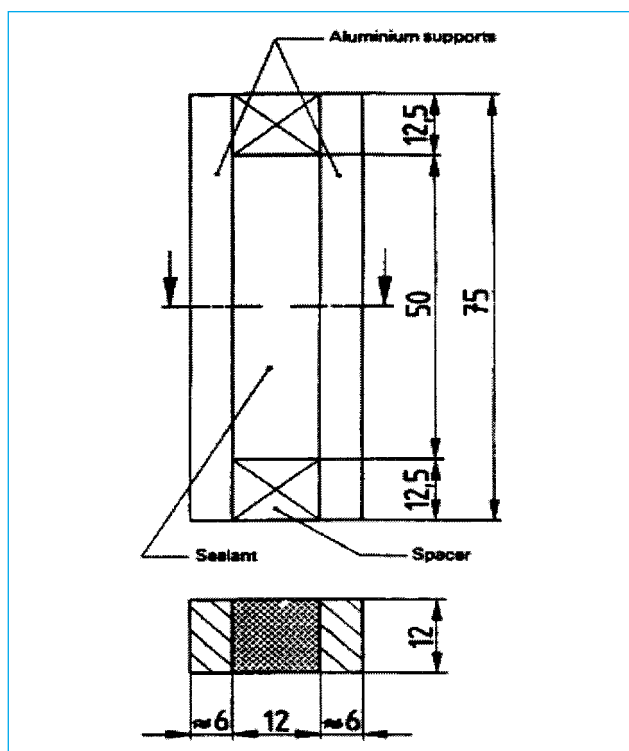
Test specimen with anodised aluminium supports (all measurements in millimetres).
